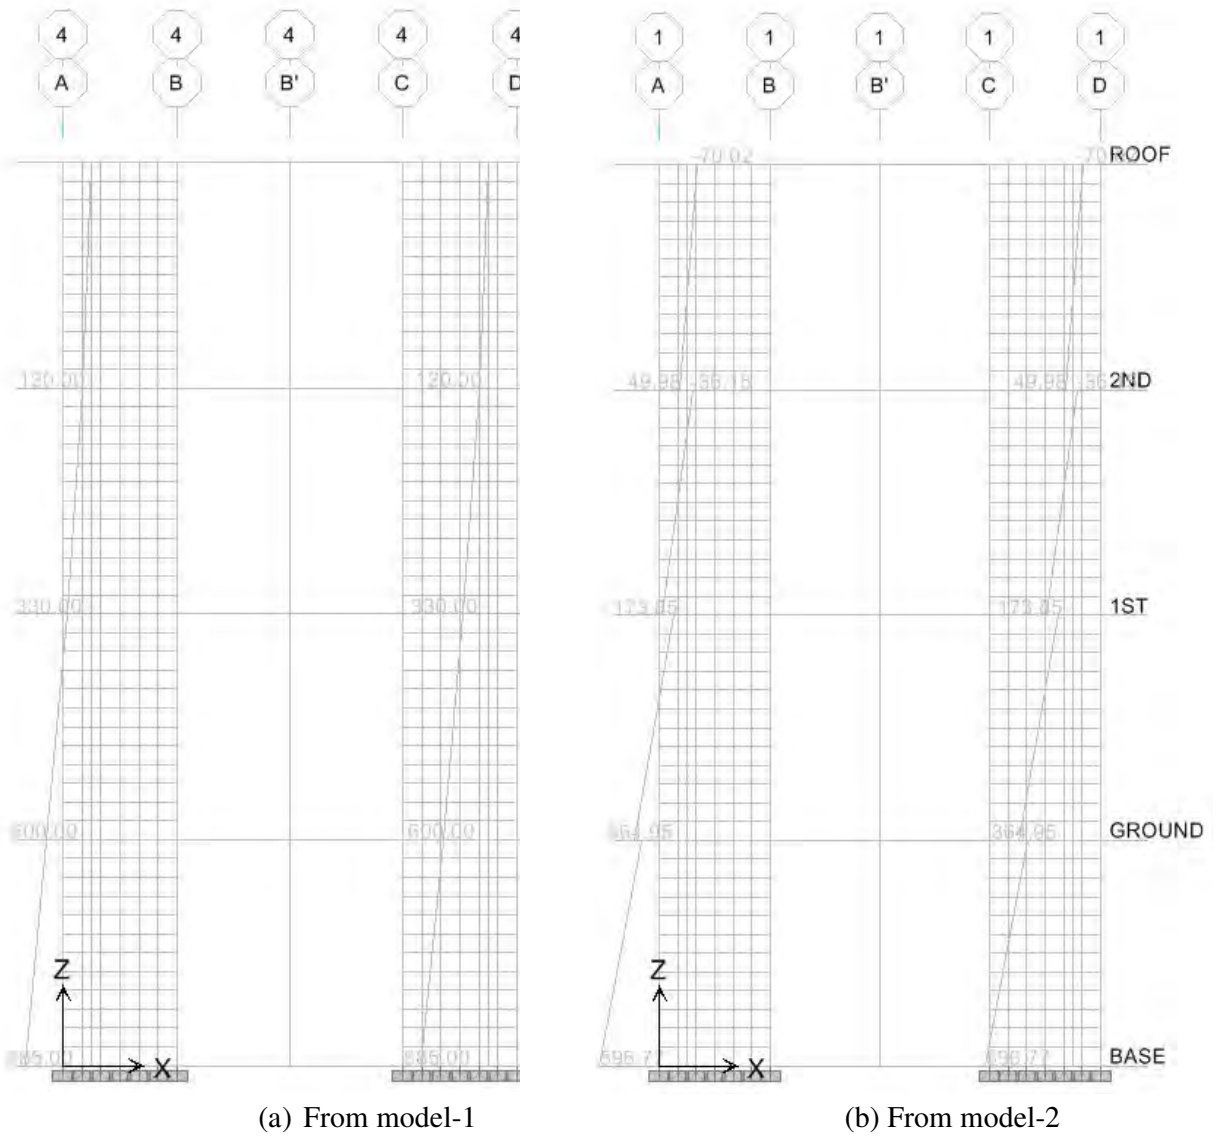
Moment diagram for wall-1 and 2 of arrangement -2
